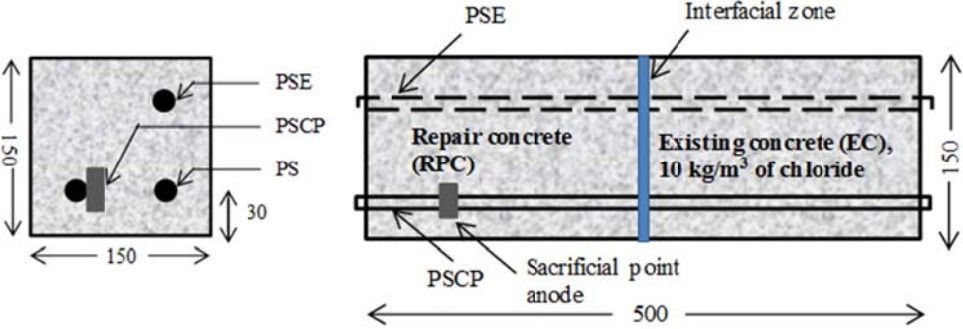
Detail of specimen repaired concrete (unit: mm)
